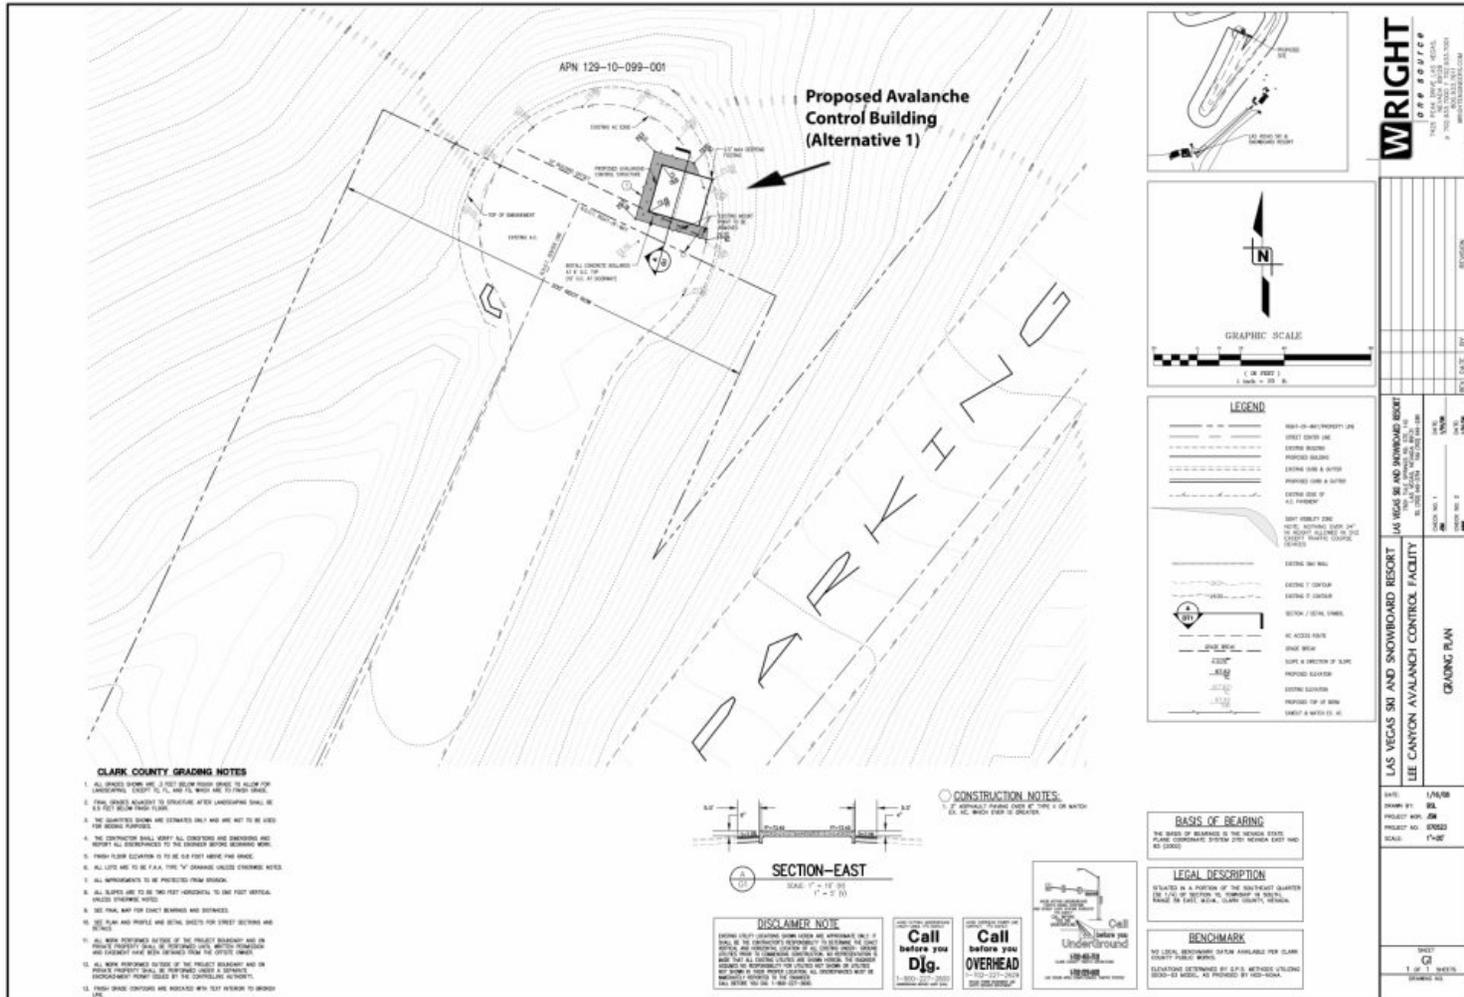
Alternative 1 Storage Facility Location on Highway Turnaround
